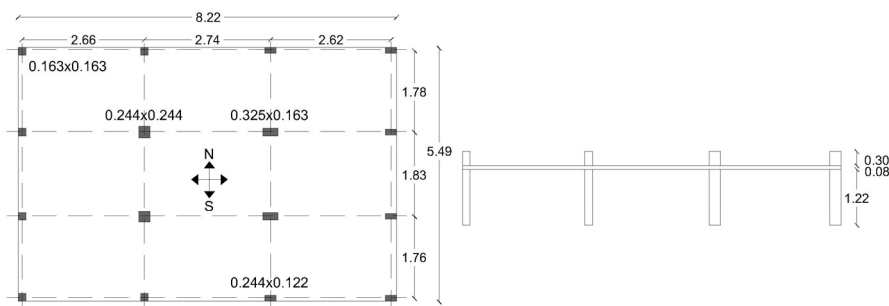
Specimen geometry - Single flat-slab floor (m) [10], [11]
